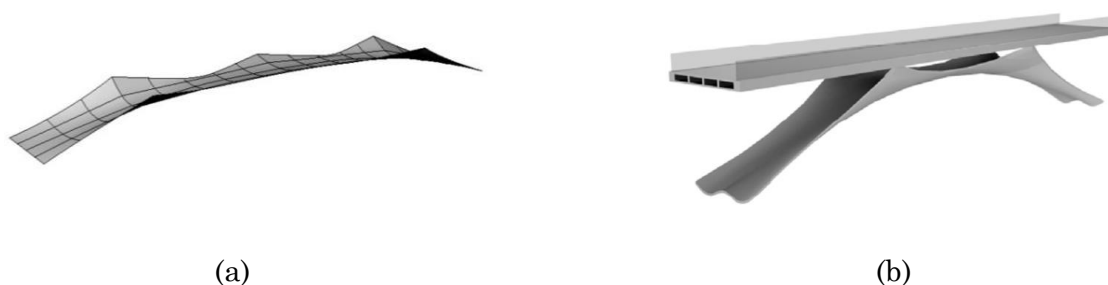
(a) Form found shape of the load-bearing shell structure; (b) Shell-supported footbridge design (photo credit: Fenu et al., 2020).
